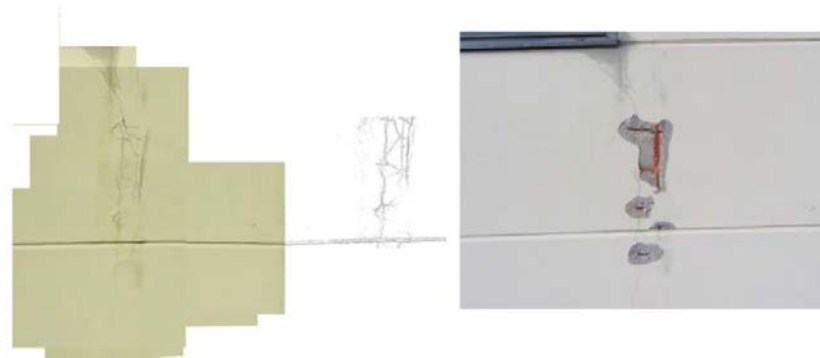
Damage in a concrete wall (left), resulting crack pattern (middle) and damage 11 months later (right)
